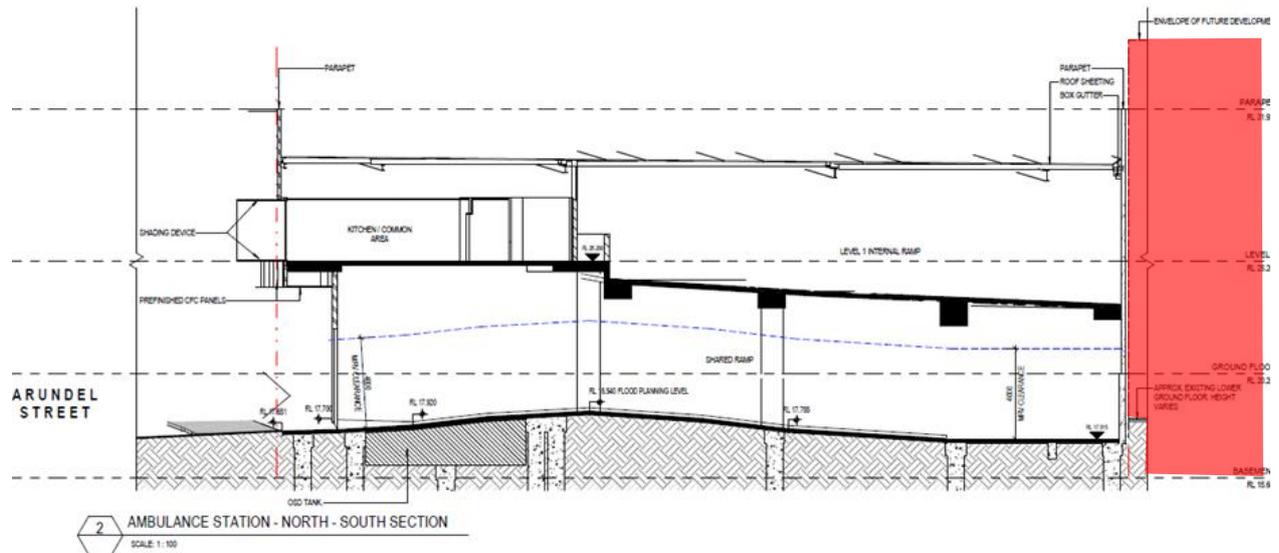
Ambulance Station - North-South Section, extent of envelope for Stage 2 works shown coloured red
